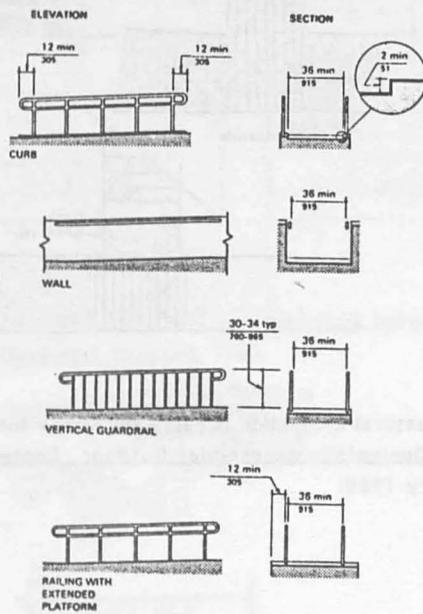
Ramps. ANSI, American National Standard for Buildings and Facilities, 1986.
